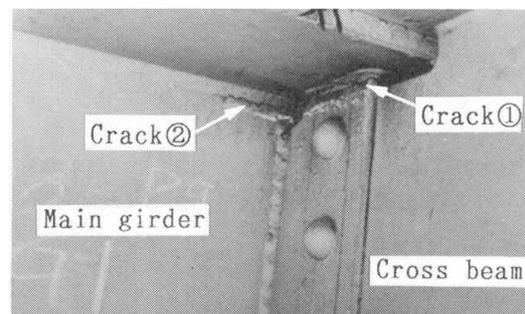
Fatigue cracks occurring at cross-beam connection
